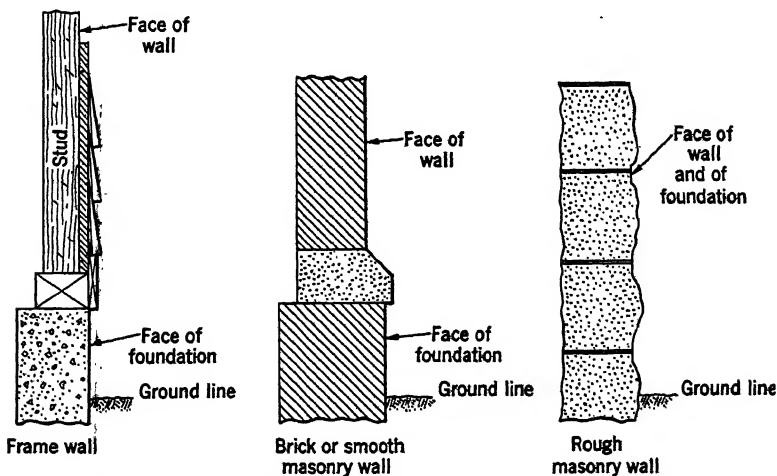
Typical walls. Measurements to buildings are made to face of wall or to face of foundation and so noted.
